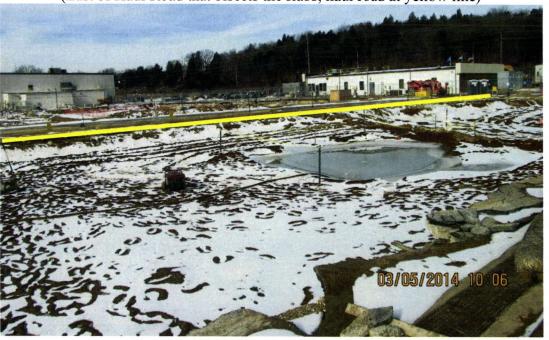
Former Process Building Slabs Excavation Area (West of Haul Road that bisects the slabs)
